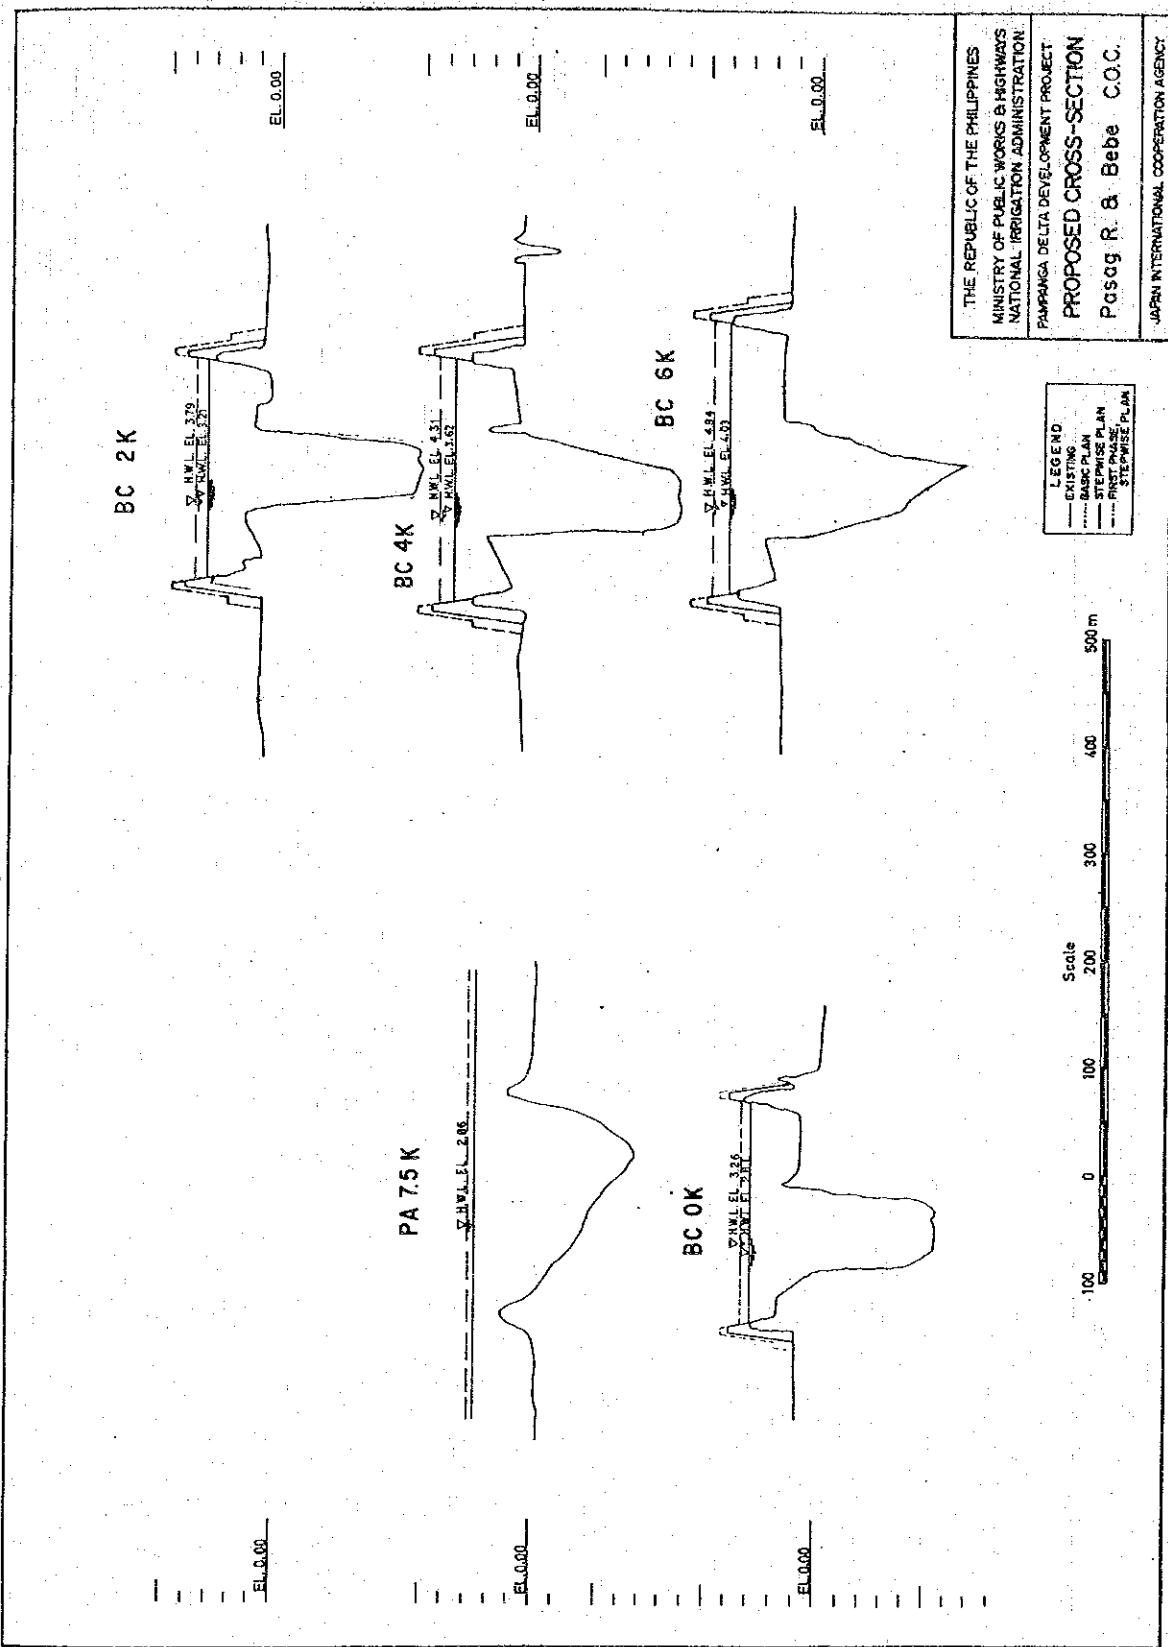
(13) PROPOSED CHANNEL CROSS-SECTION
